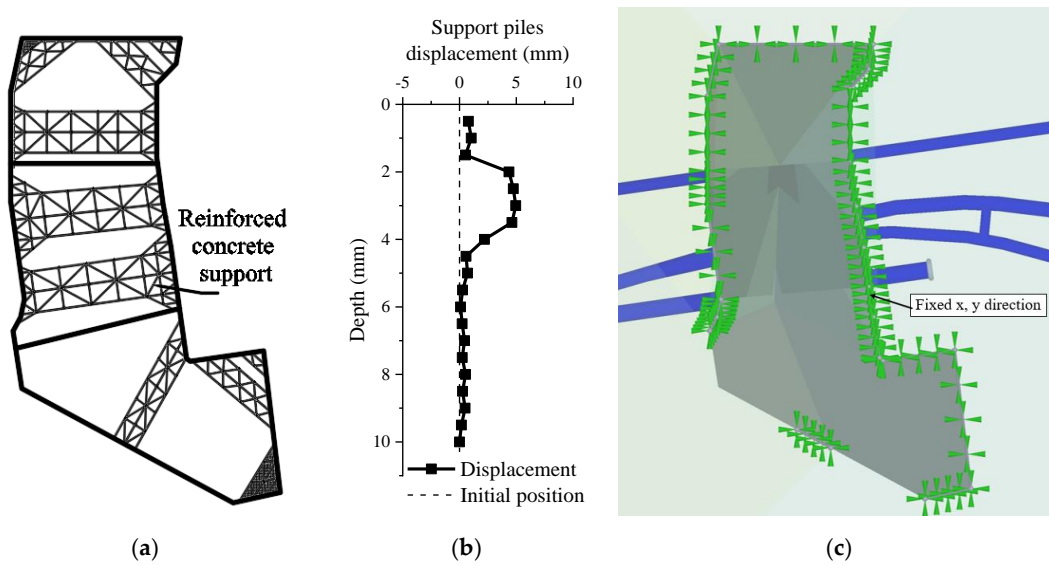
Simplification treatment of support structure: (a) reinforced concrete support layout; (b) support pile displacement; (c) simplified model.
